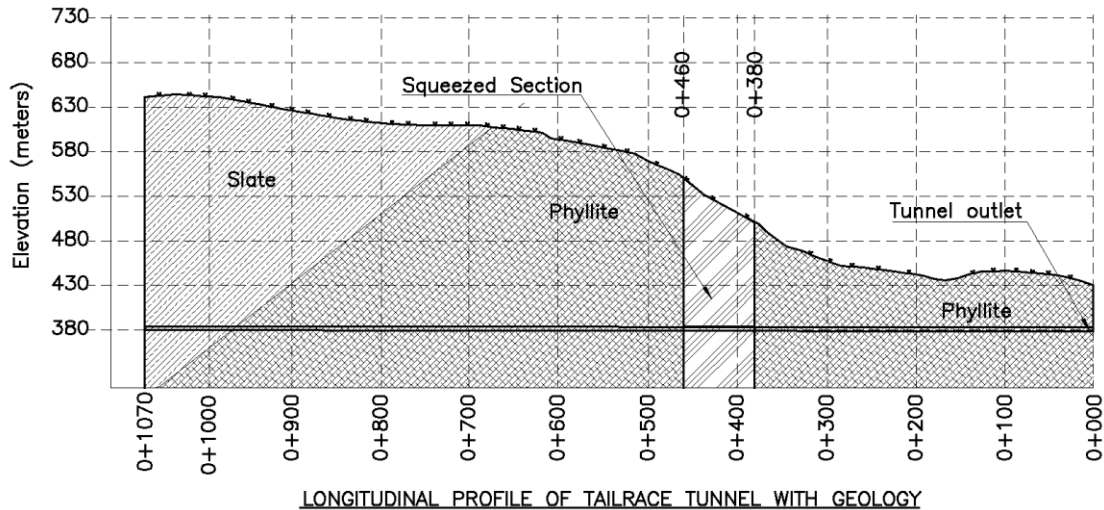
Longitudinal profile of tailrace tunnel of Andhikhola Hydropower Project
